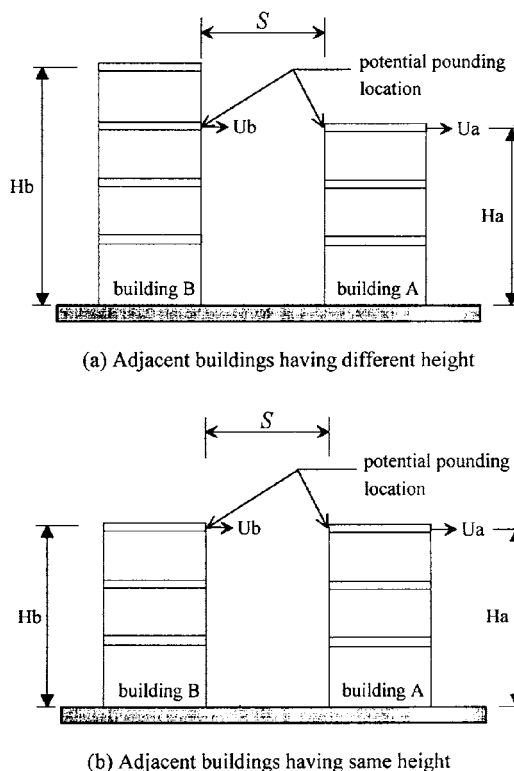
Potential pounding location: (a)Adjacent building having different height; (b)Adjacent building having same height
